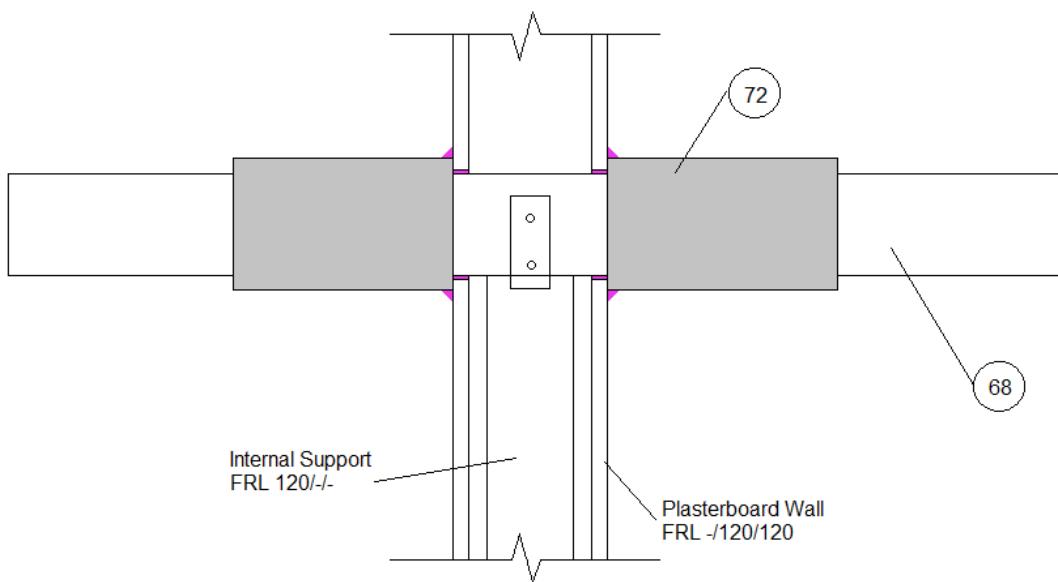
Insulated C or Z-purlin/I-beam through Plasterboard Wall Construction- Case A
